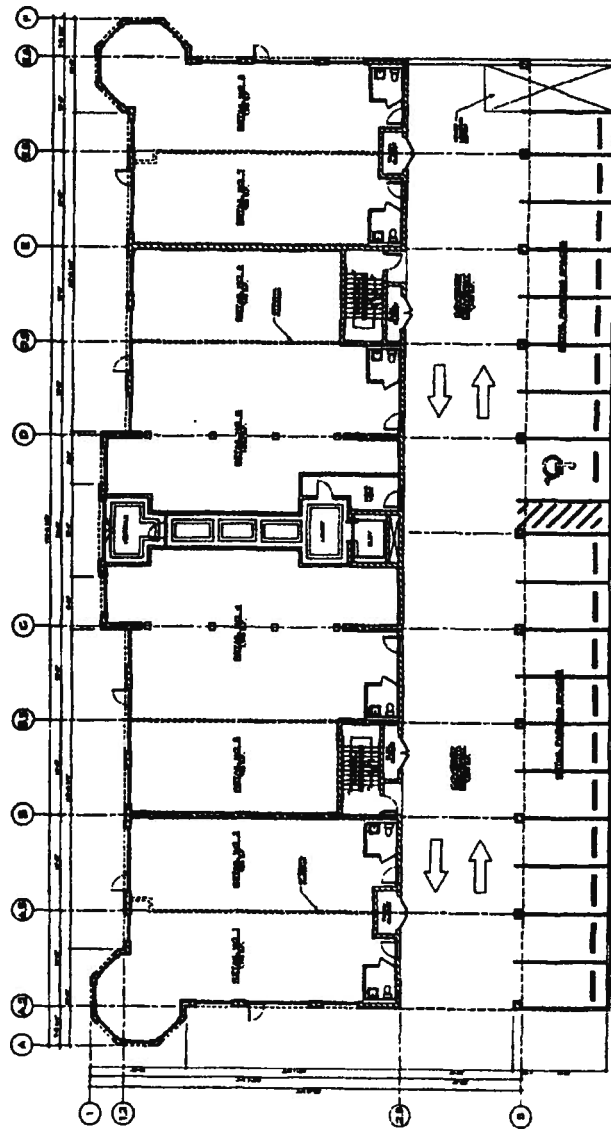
FIRST FLOOR RETAIL PLAN. (SEE SECTION 1-1 FOR DETAILS.)
